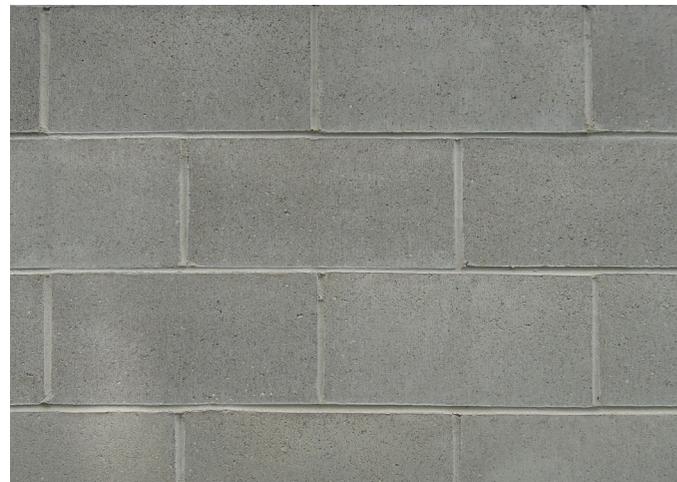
EXISTING CONCRETE MASONRY UNIT WALL
